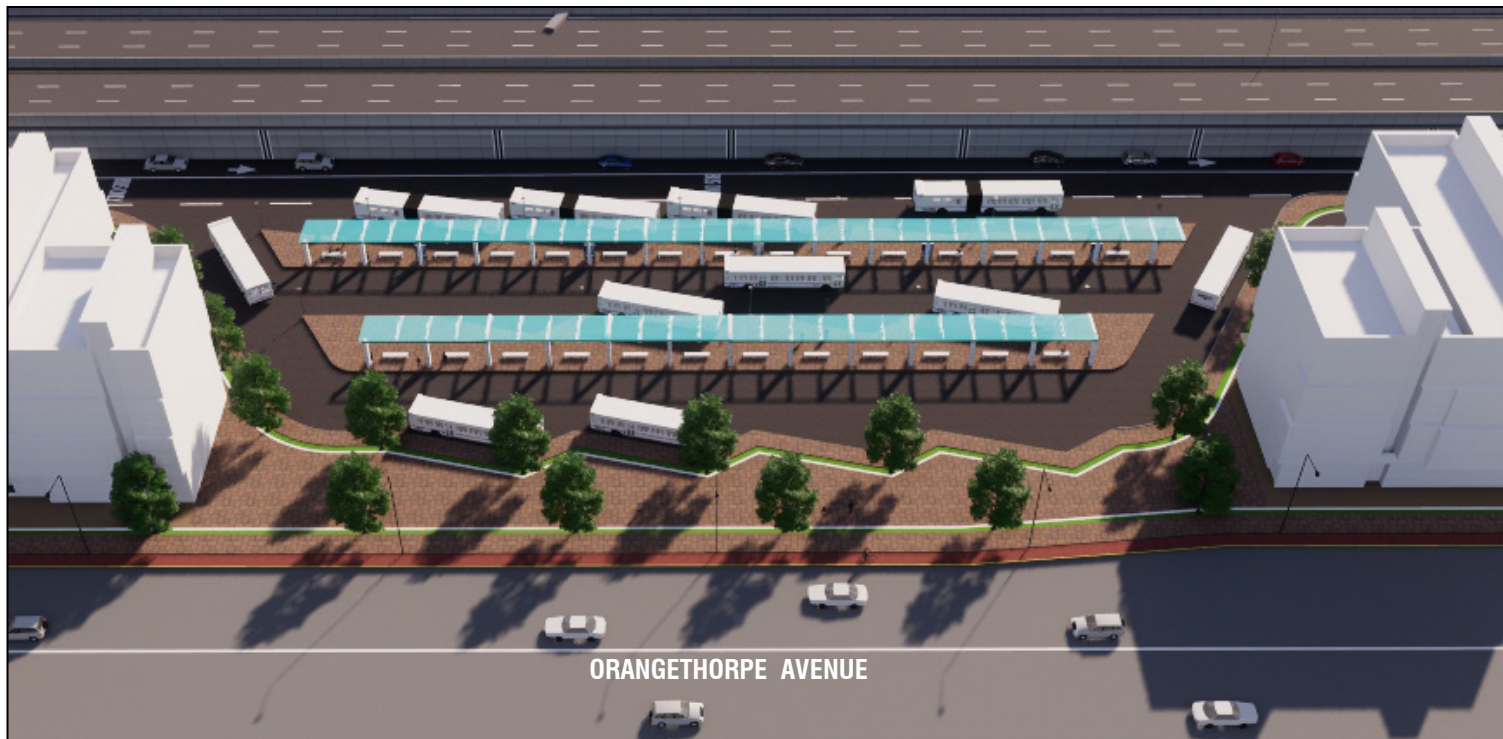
Rendered view of the proposed bus parking layout (West Central District)
